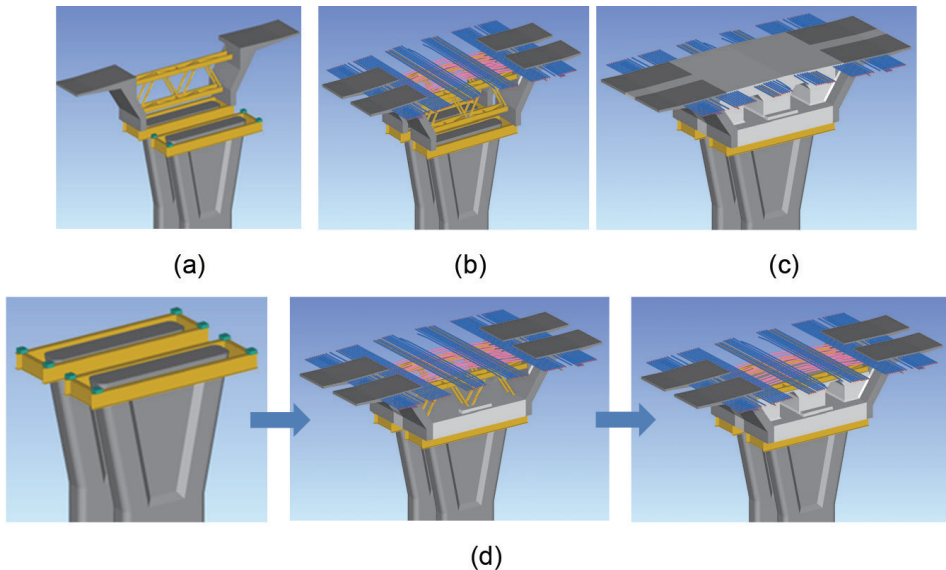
(a) Installation of Temporary Support Brackets (b) Lifting and Installation of Precast PierTable Segment (c) Placement of Post Tensioning Ducts & Reinforcement (d) Cast-in-Place Concrete Works
